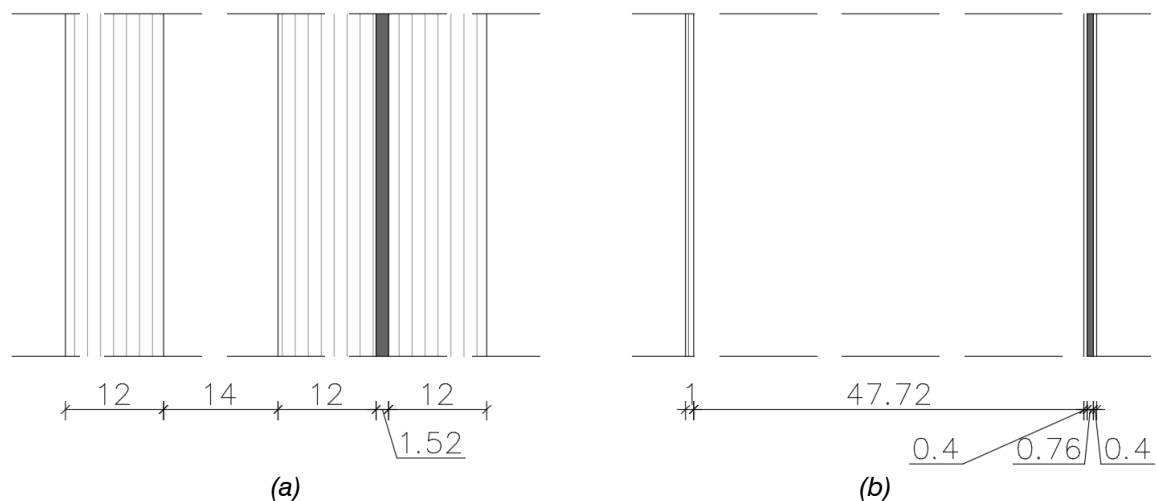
(a) Section existing façade 12/14/12.12.4; (b) section inflatable design façade 1/48/0.4.0.4.2
